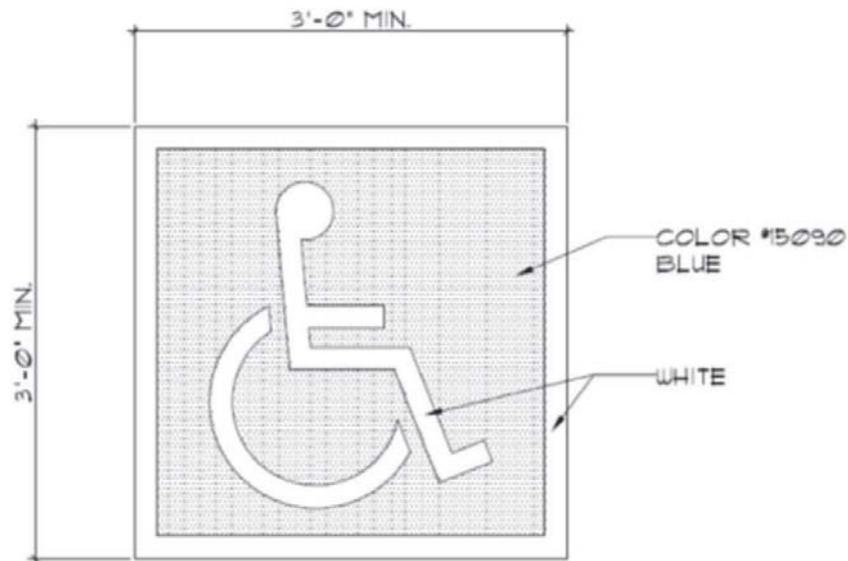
Accessible parking stall pavement symbol by SSA.
